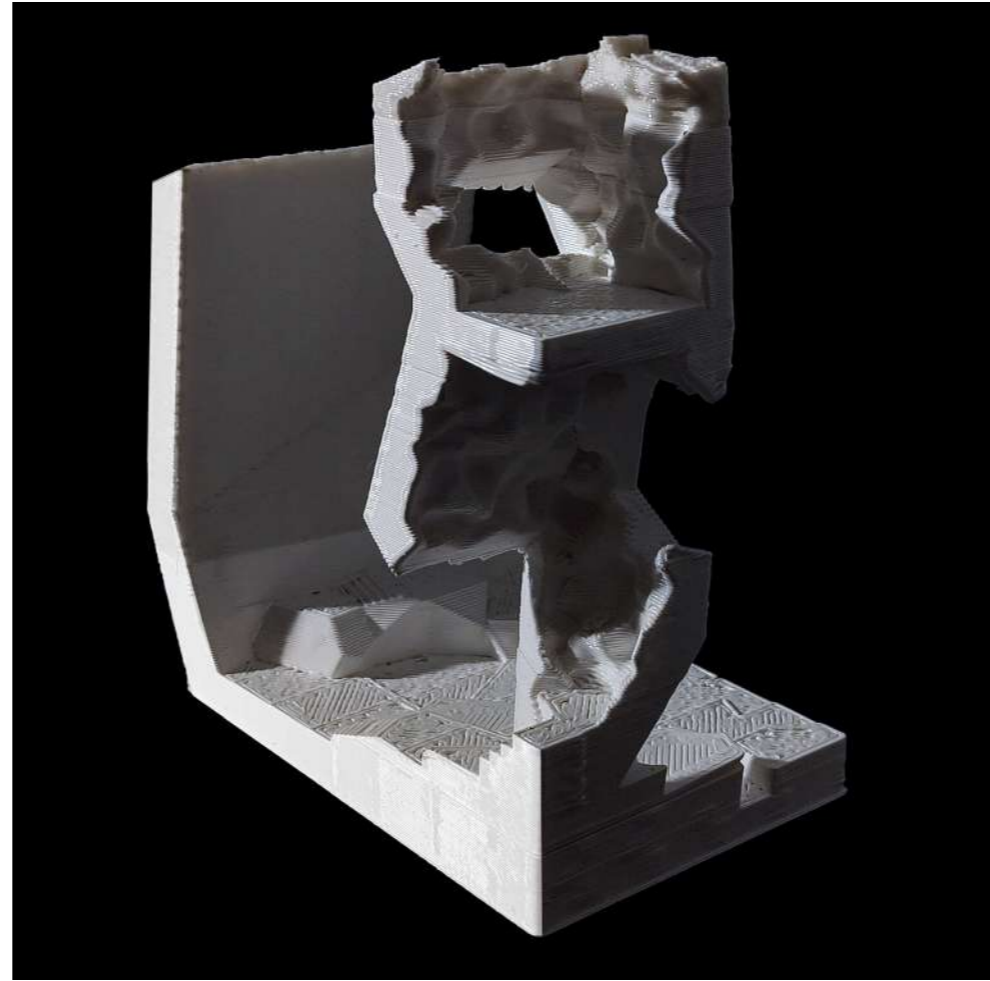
DETAIL SECTION - TYPICAL STRUCTURAL STRATEGY
